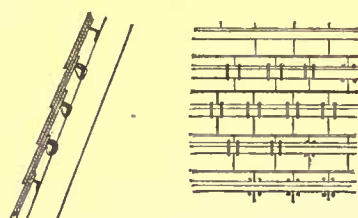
INSIDE VIEW OF SLATE AND PURLINS. Slate fastened to L or T shaped rolled iron purlins with No. 16 B. W. G. copper.
